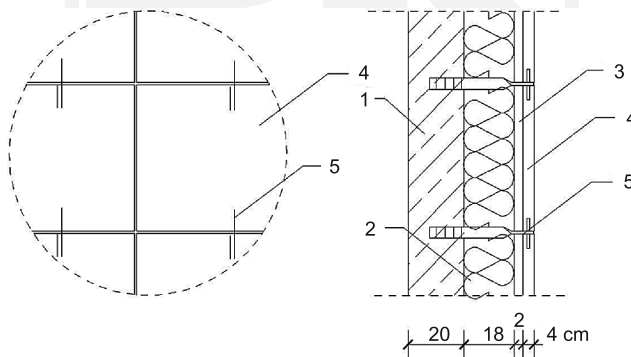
Arrangement of anchors of the board and stratification of the analyzed division. Markings: 1 – reinforced concrete wall, 2 – rock wool Wentirock, 3 – ventilated air aperture, 4 – sandstone board, 5 – bearing anchor made of stainless steel with the section 6 × 35 mm
